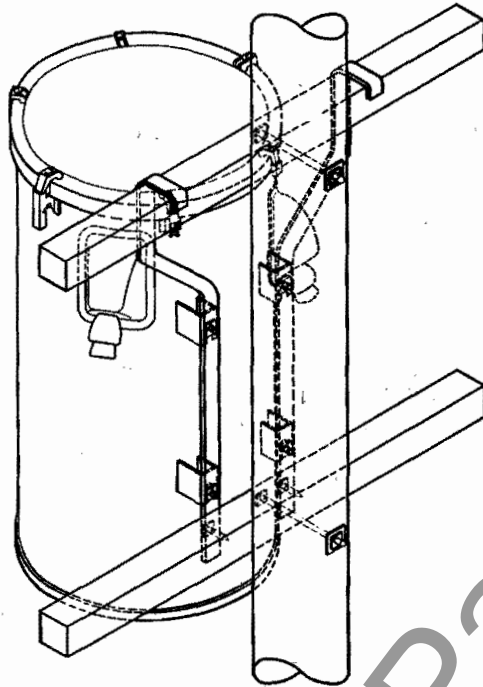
TRANSFORMER MOUNTING USING "HANGER IRONS".
